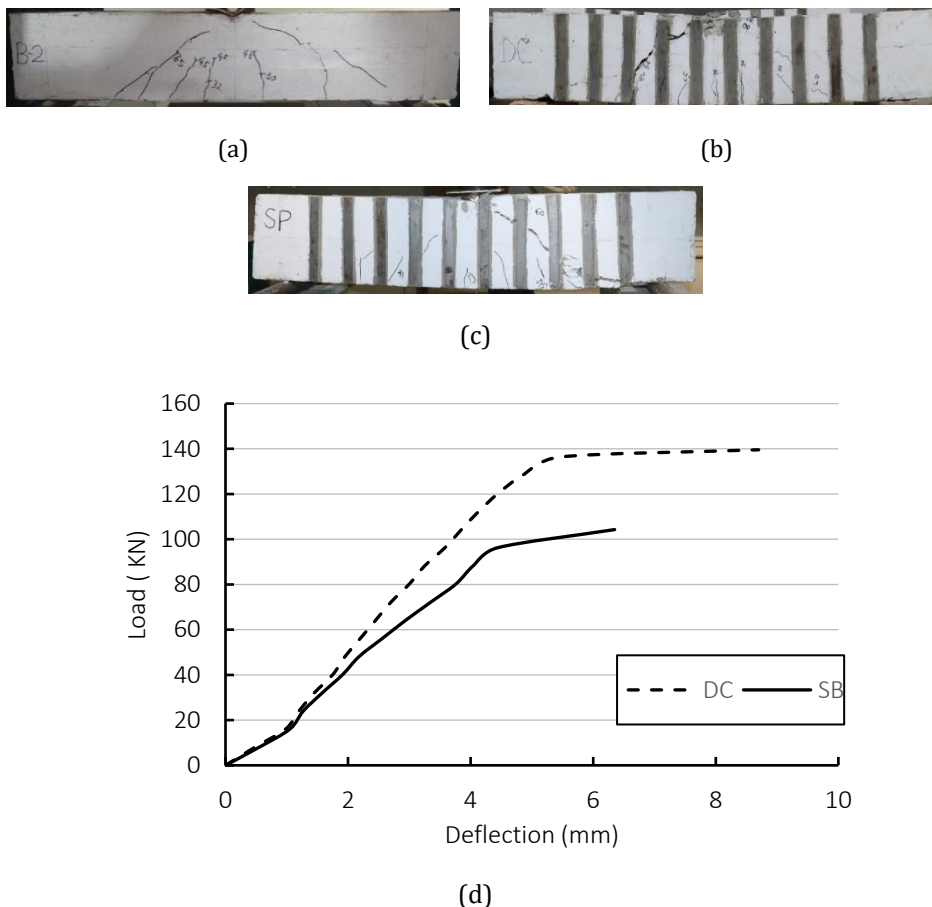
(a) Damaged beam for DC, (b) Failure mode of beam DC, (c) Failure mode of beam SB, (d) Deflections of beams DC and SB
